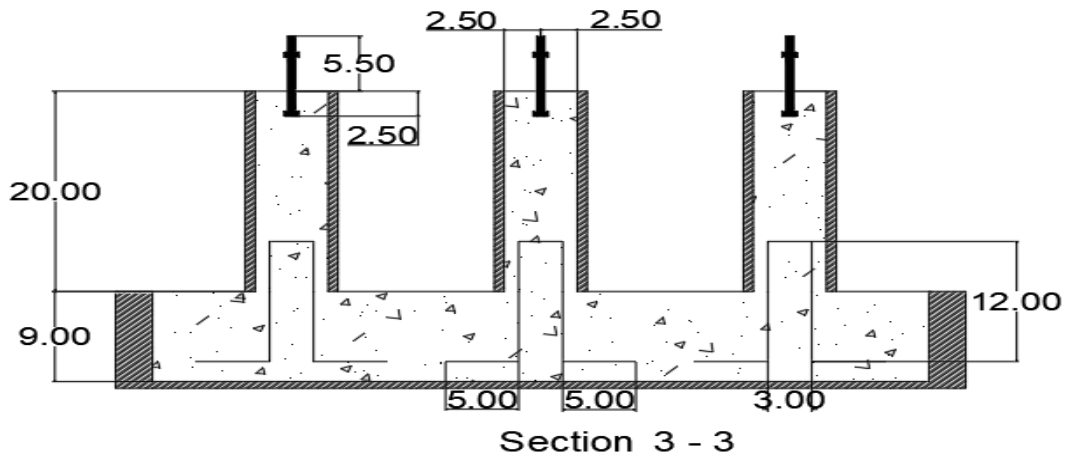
Specimen Sections (3-3), all dimensions in inch.
